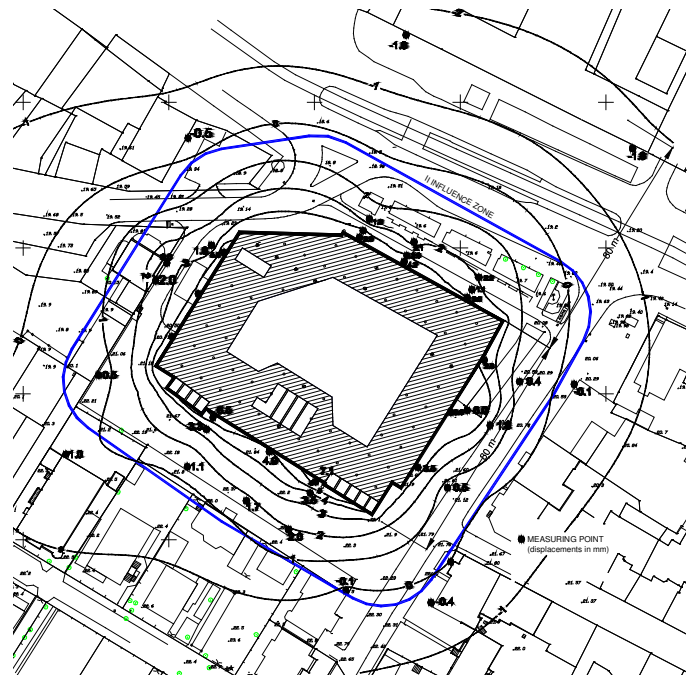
Excavation layout with indicated observation points, II zone, displacement isolines and the floor part supporting the walls.
